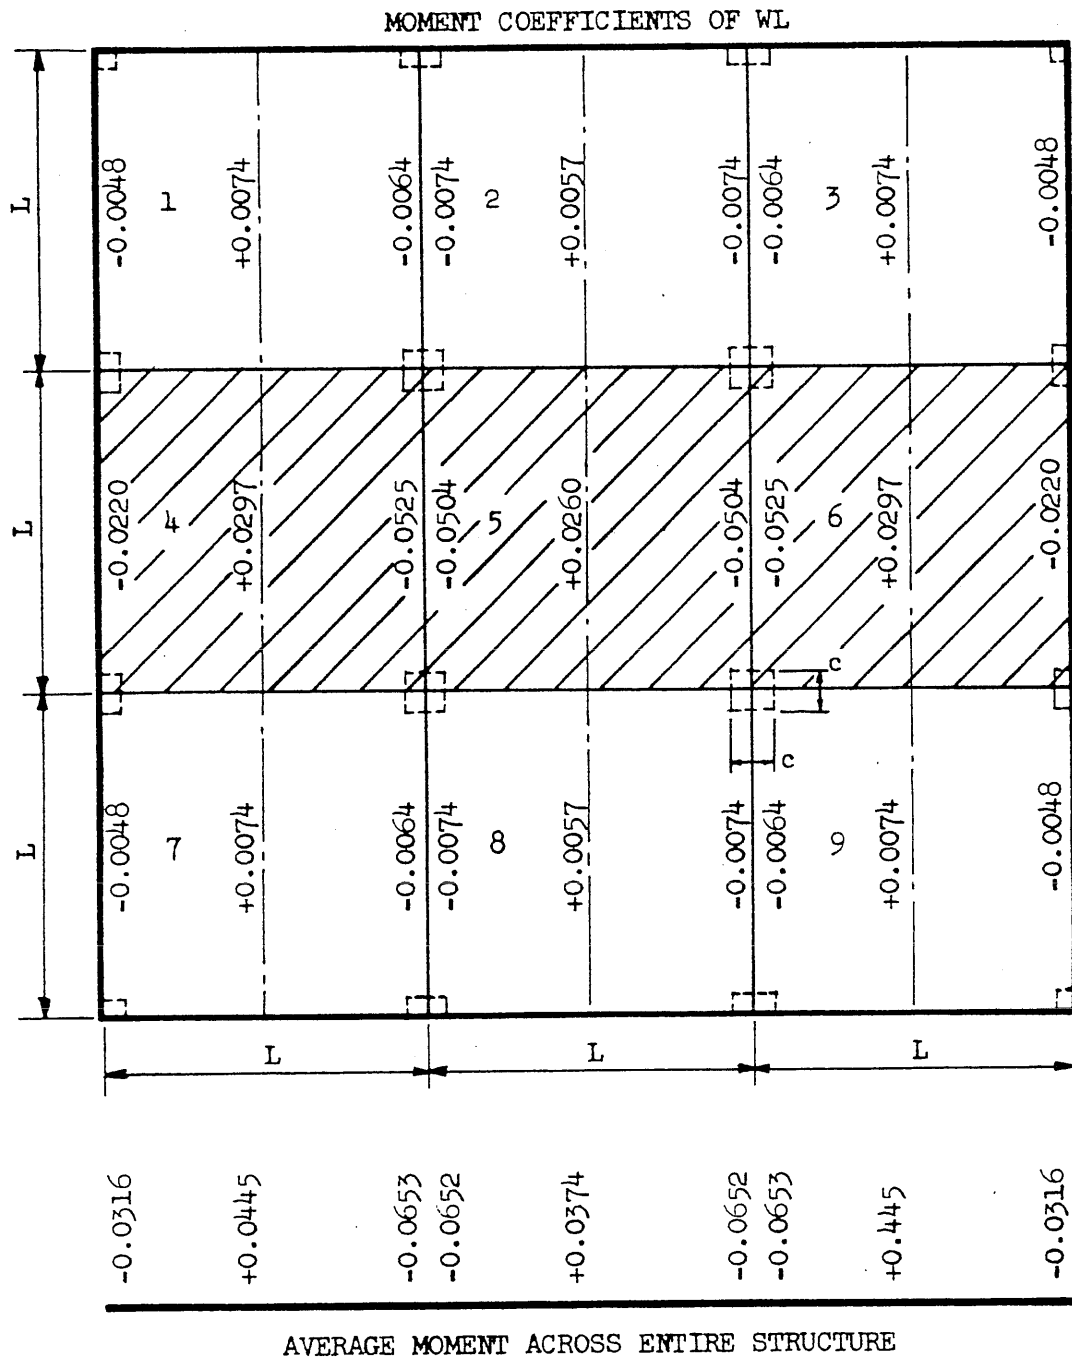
MOMENTS IN NINE-PANEL STRUCTURE WITH CENTER STRIP LOADED
